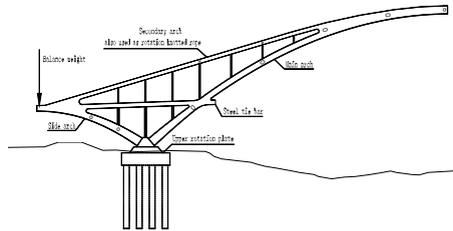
Typical Structure Sketch of Horizontal Rotation System
